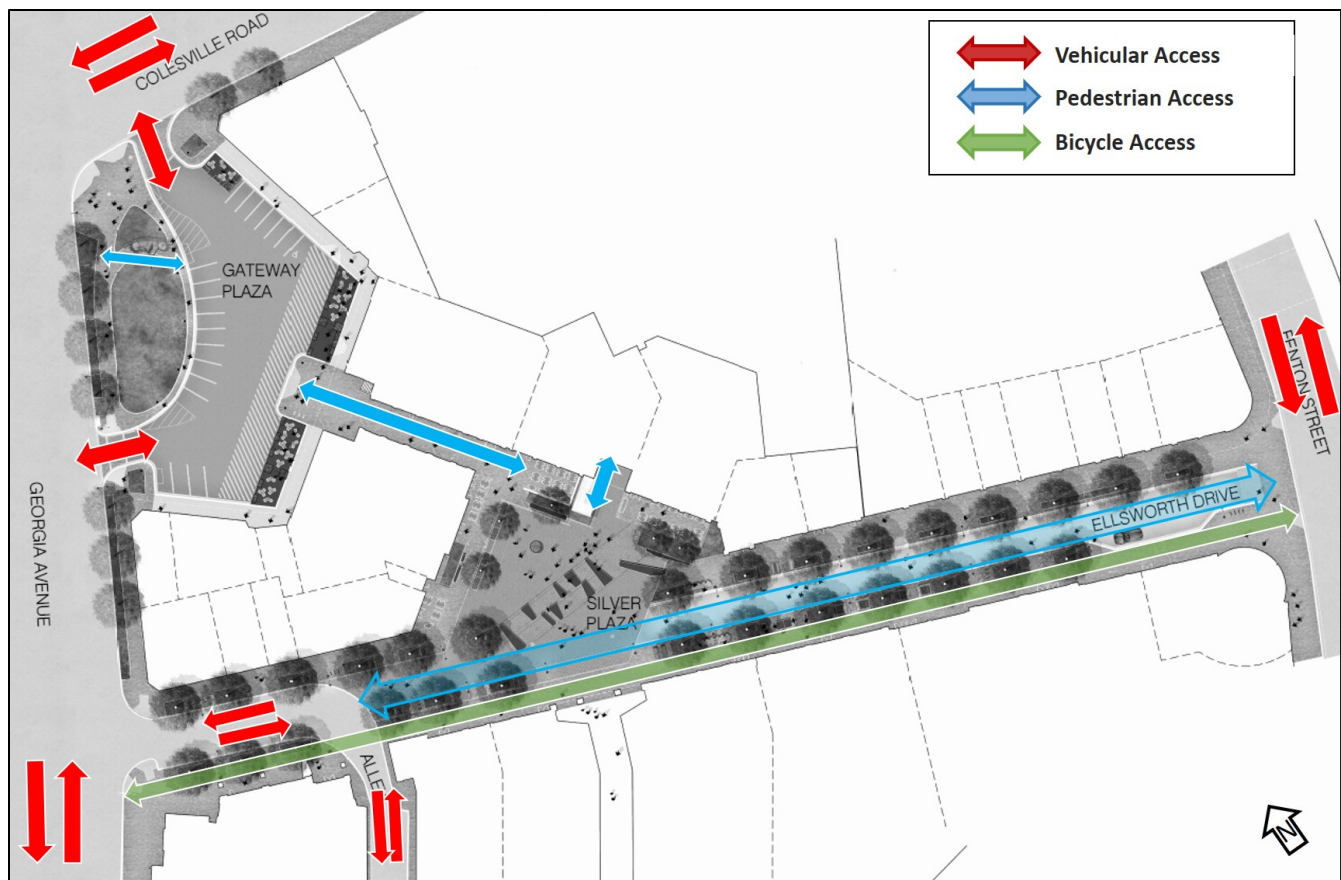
Circulation Plan for the Subject Abandonment and Subject Property
